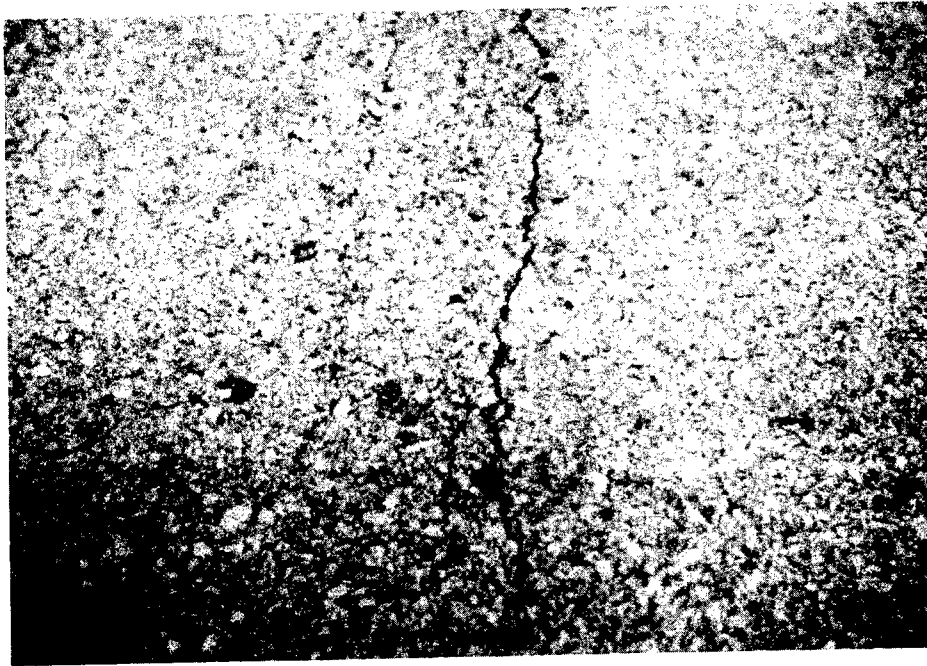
Low severity longitudinal crack, flexible pavement
